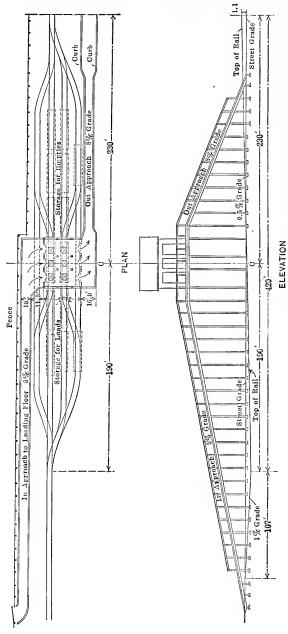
Proposed General Layout of Station for Loading Refuse on Railway Cars, Chicago, III.
